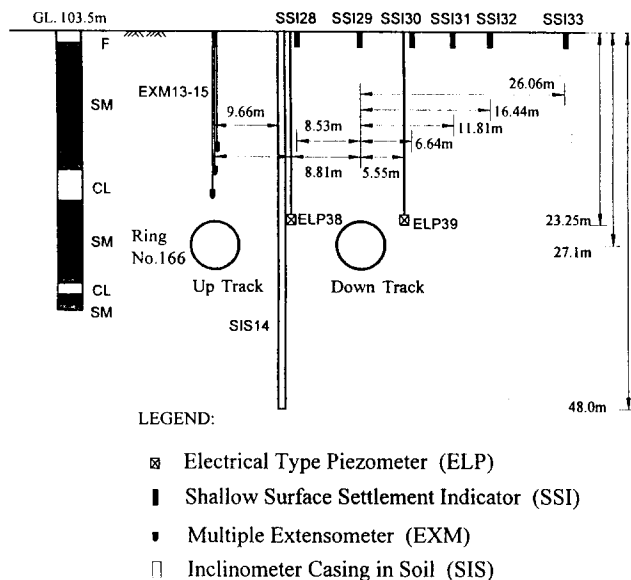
Soil Profile and Instrument Layout at Section 261T2
